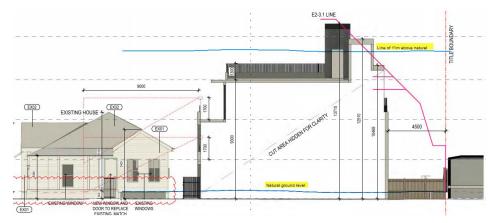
North-South cross-section demonstrating maximum building heights above NGL
